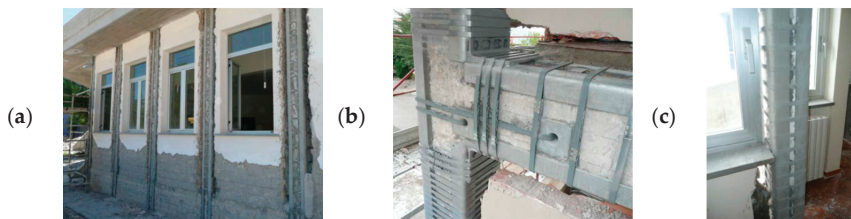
Images of a typical ACM-based retrofit intervention on a building with RC frame structure: view of a façade (a), a beam-to-column joint (b), and a column situated in proximity to two windows (c)—pictures taken from [50].
